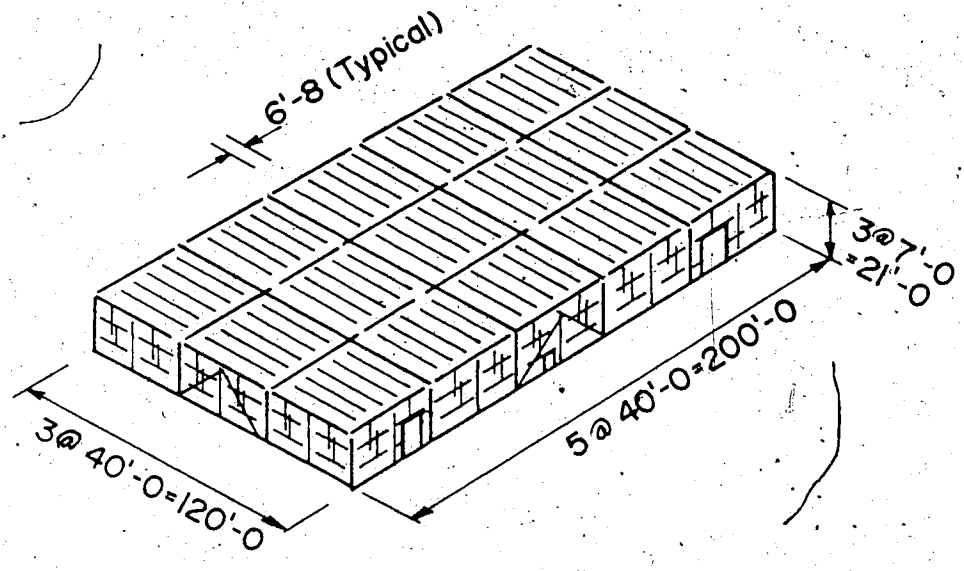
· A LIGHT INDUSTRIAL BUILDING STRUCTURE
